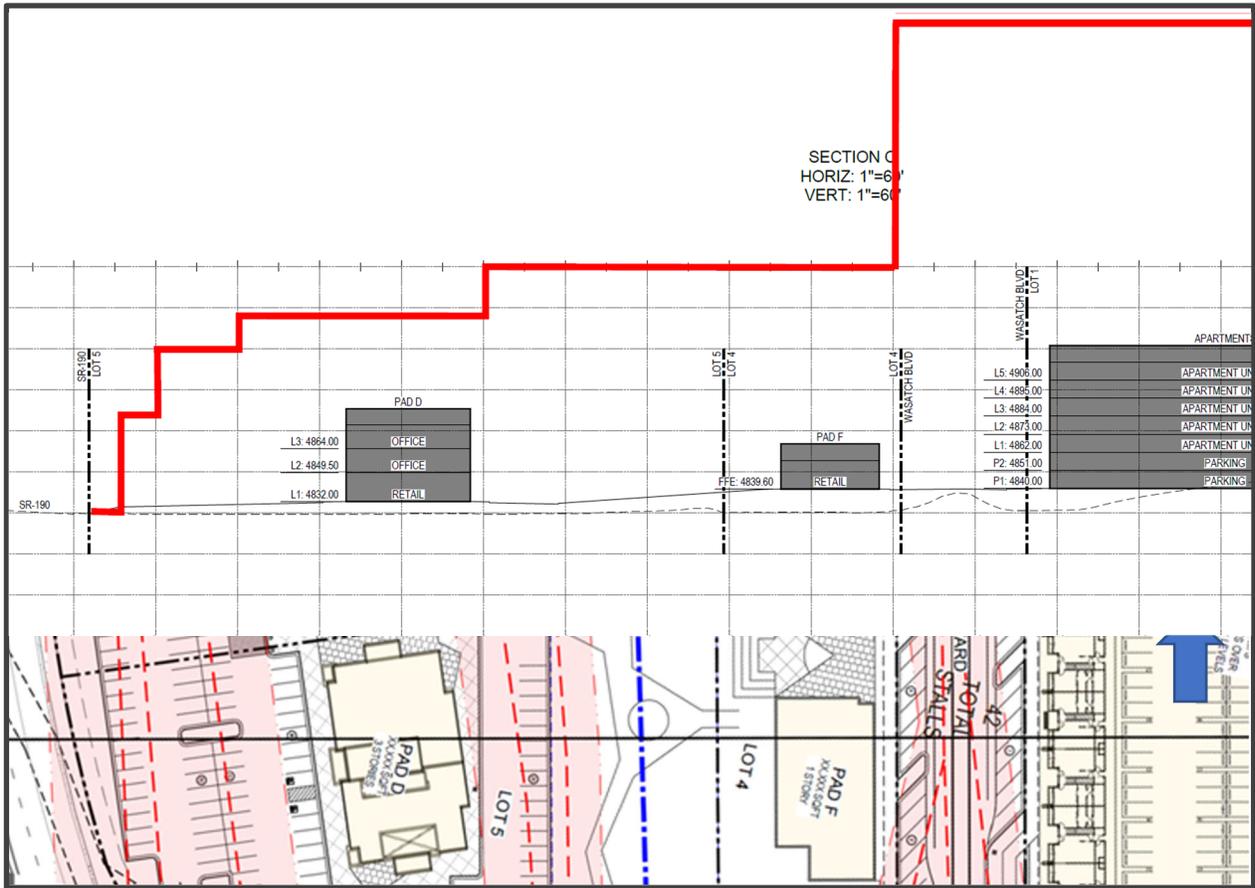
SOUTH BUILDINGS - HEIGHT CROSS SECTION (RED MAXIMUM HEIGHT PERMITTED)
